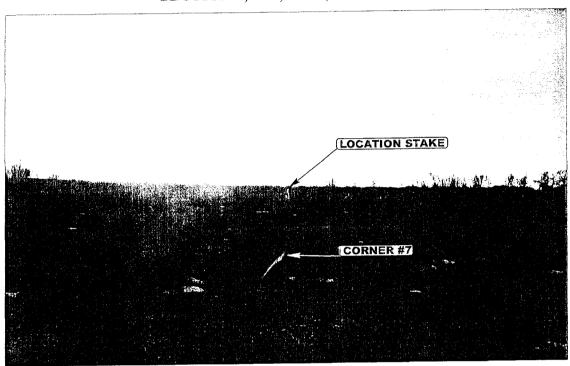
PHOTO: VIEW FROM CORNER #7 TO LOCATION STAKE
